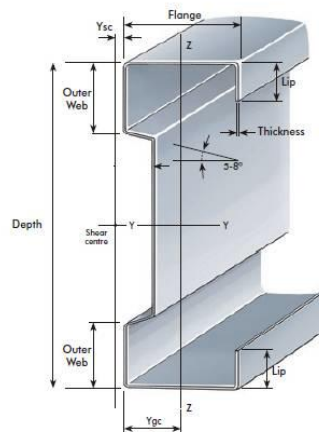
Typical view of sigma section. (Anna Green Antony, 2016)
